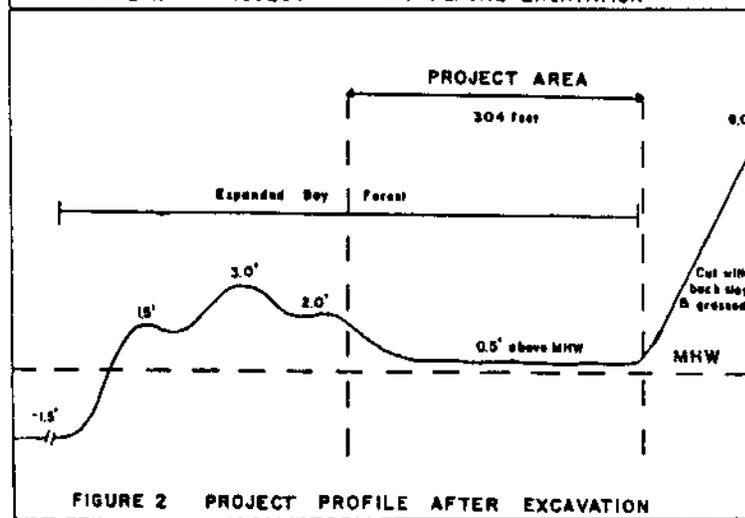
PROJECT PROFILE AFTER EXCAVATION
